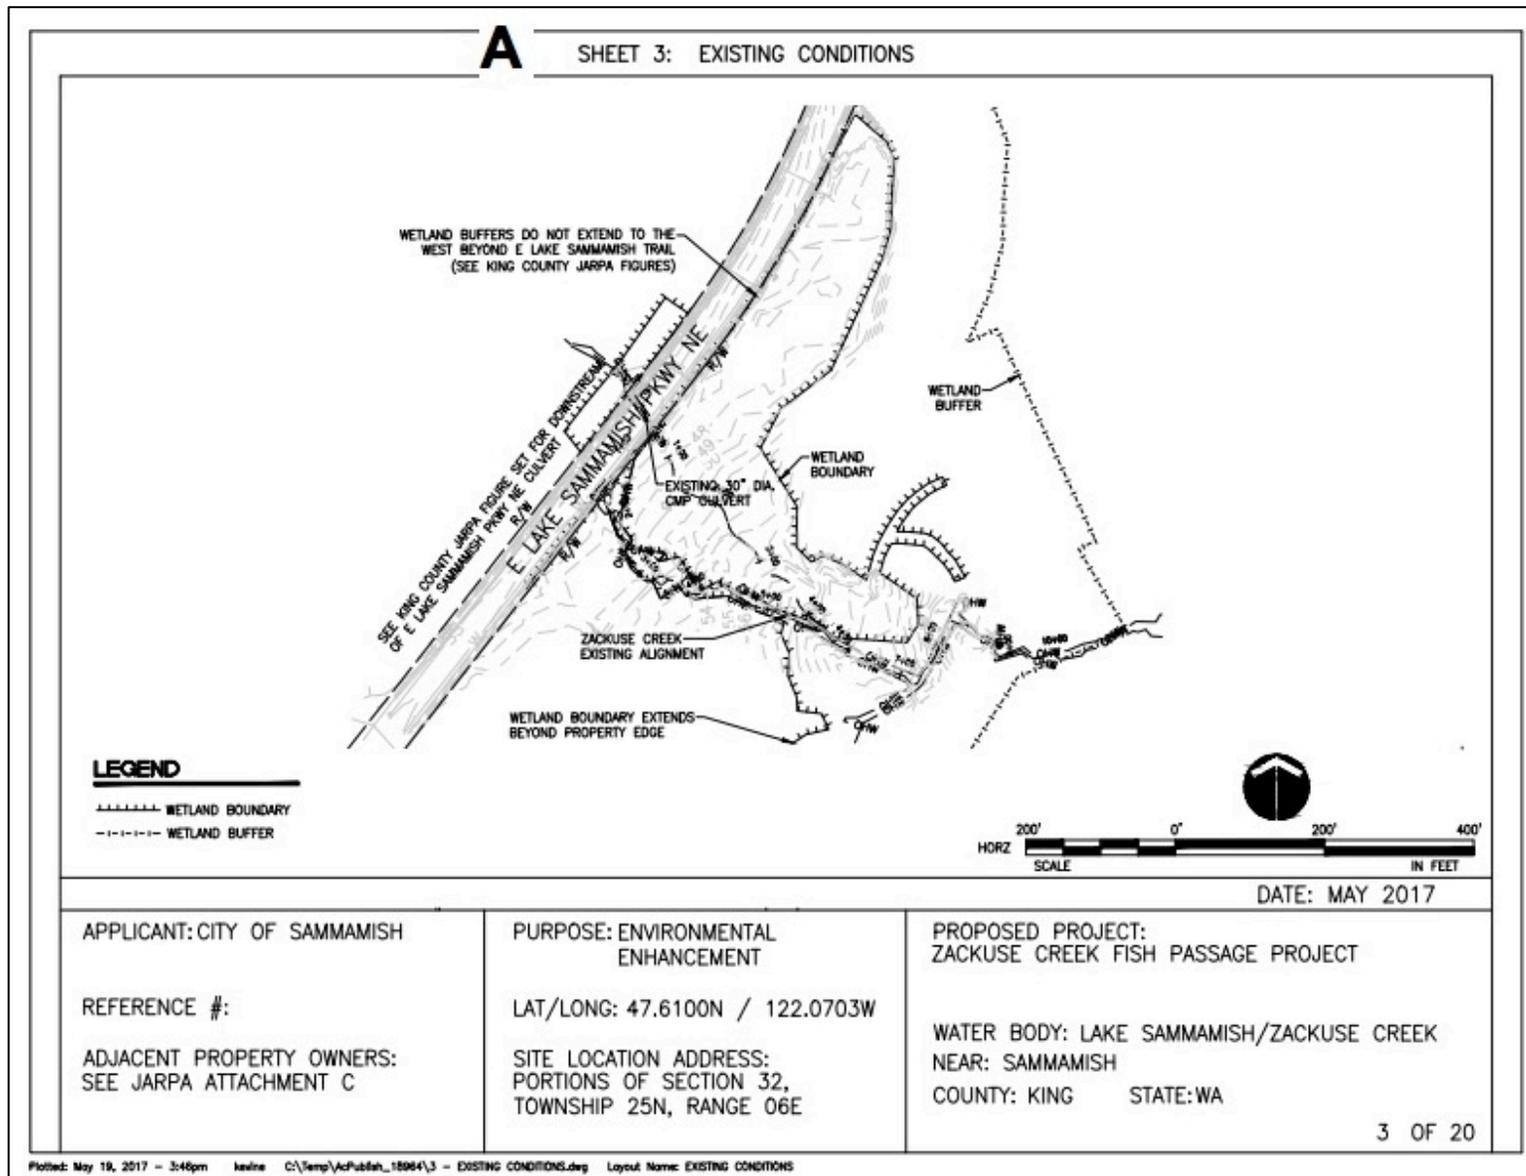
Project plans – existing conditions, provided by Otak, Inc.
